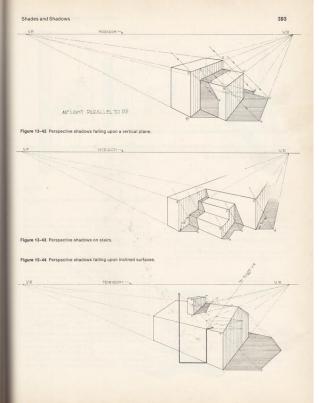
shows the shadow of a vertical line being interrupted by a vertical wall plane. The shadow of point A cannot be established until the horizontal shadow line from point E is projected to the receiving wall. The remaining diagonal line above point a is a part of the shadow of line A-D and is completed after the horizontal shadow of line A-D is projected on the top of the small block (line A-D is projected on the top of the small block (line x-y). Line a-x-y- it the shadow of A-D falling on perpendicular surfaces. From Fig. 13-42 we see that:
